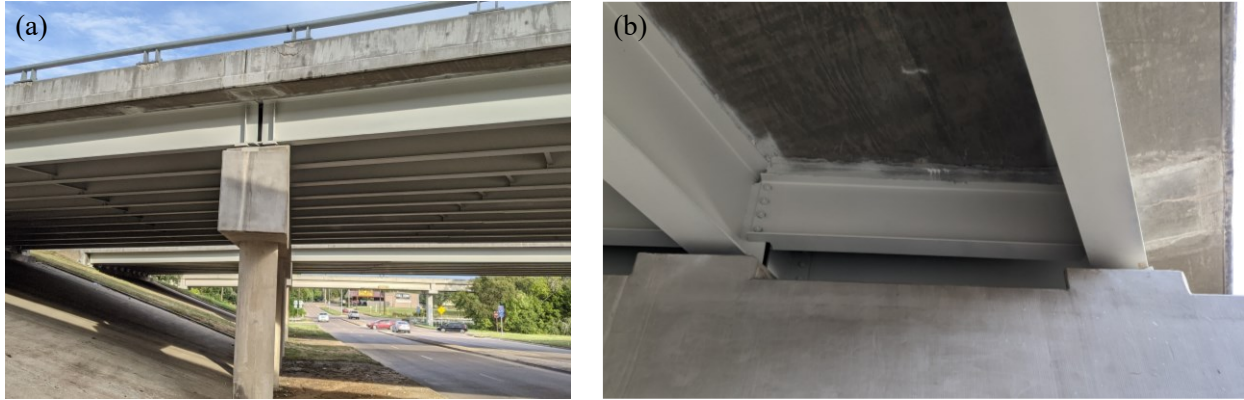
Overall Photos of the I-635 Bridge at an Interior Bent: (a) Elevation View and (b) Underside View.
